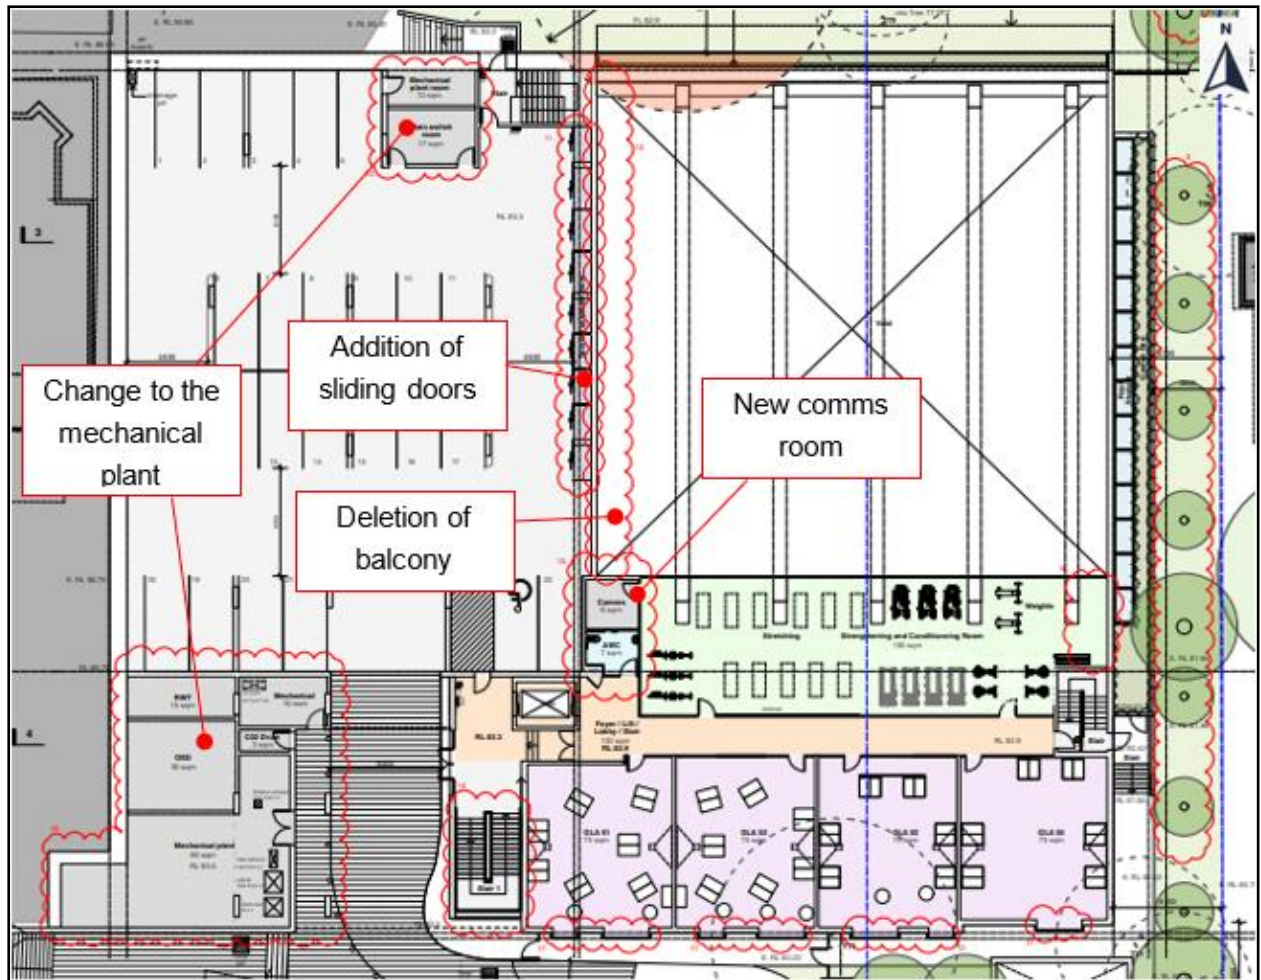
| Proposed level 2 modifications (Source: Applicant's Modification Report 2022)
